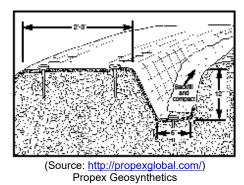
Longitudinal Anchor Trench Detail (Trapezoidal Channel)
